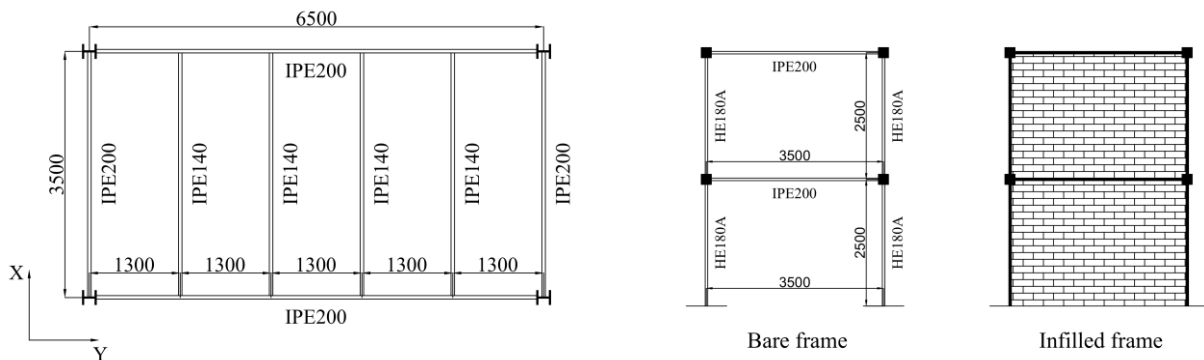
Floor plan and side views of the case study steel frame (unit: mm)
